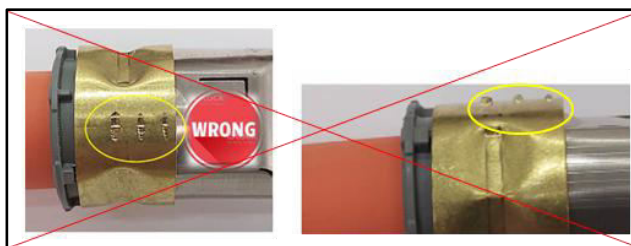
Example of unacceptable damage caused by pressing
